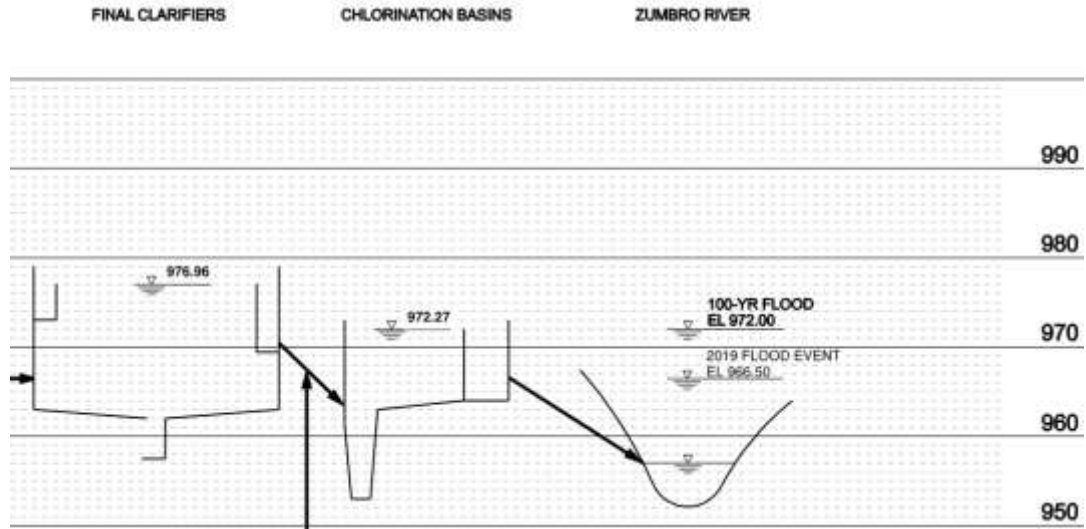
WRP existing hydraulic profile (51 mgd)
